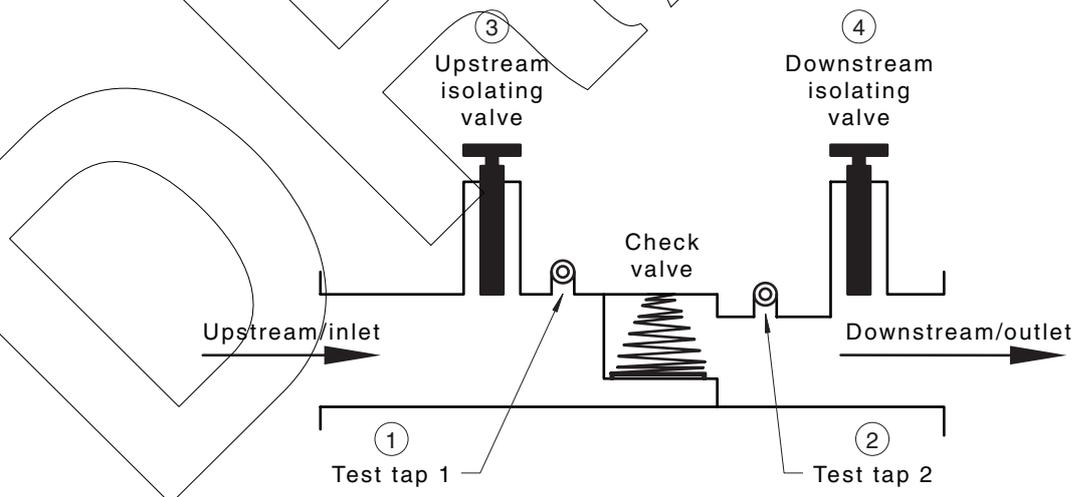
Typical test arrangement for single check valve testable (SCVT)
